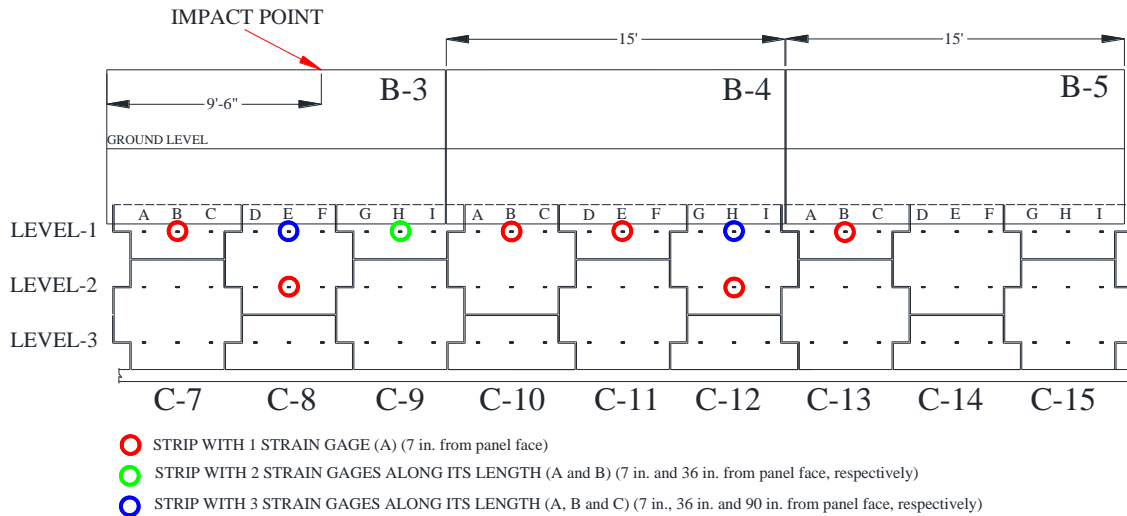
Selected strips with strain gage location for the TL-5 test wall
